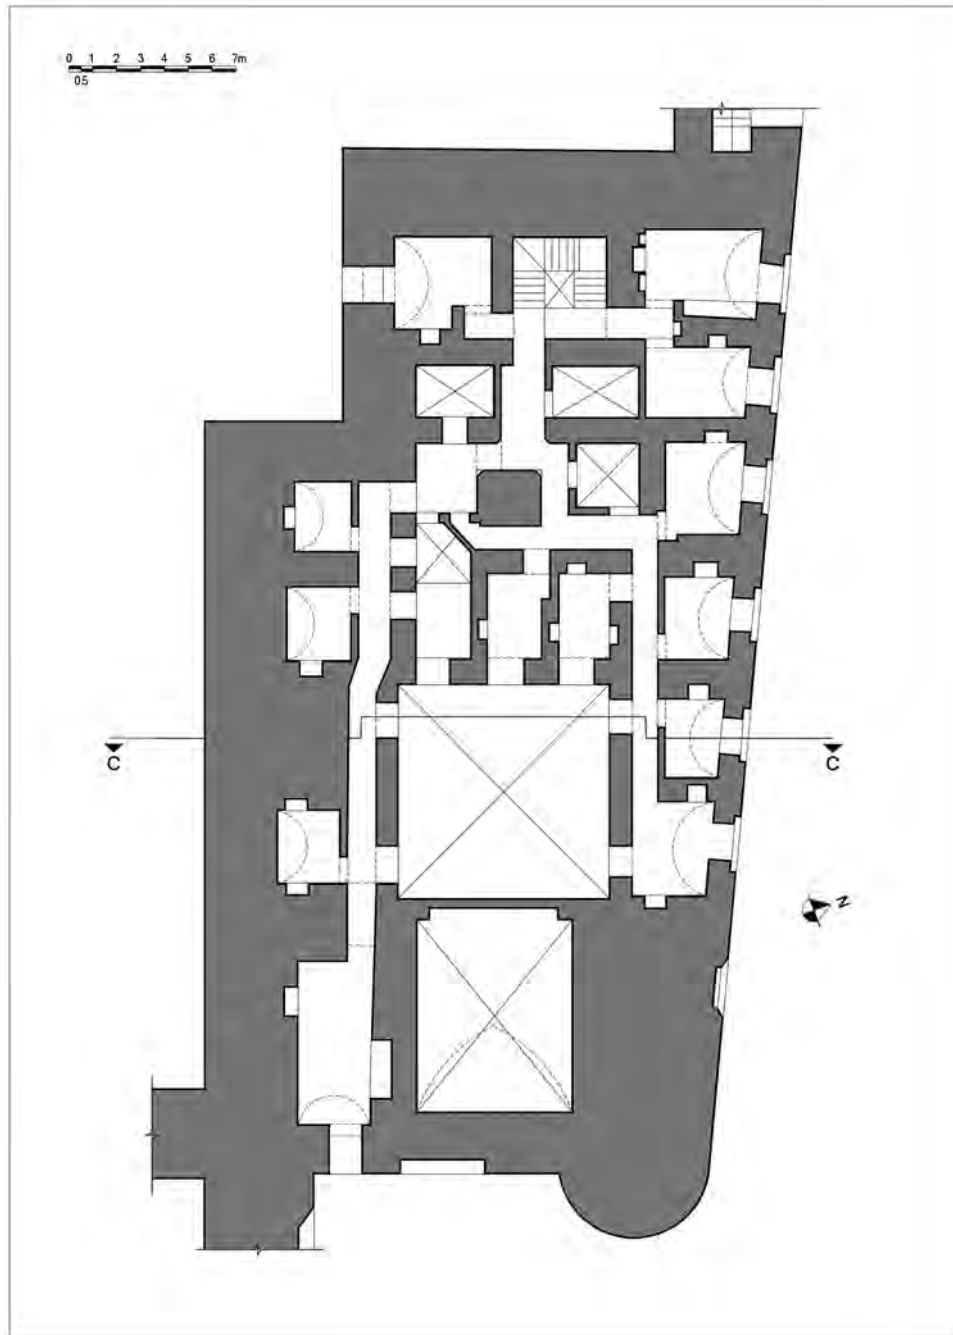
Shāfi'iyah Madrasah, Complex of Sultan Ḥasan, Cairo, fourth floor plan (H. Al-Harithy)
